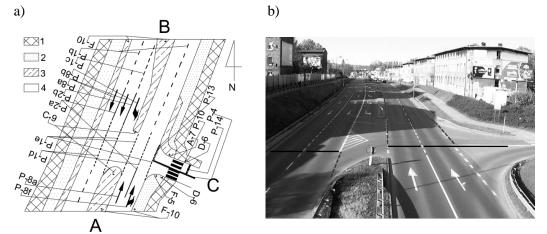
The intersection under study: a) the scheme of the intersection (designation of the surface type: 1 – sidewalk, 2 - grass, 3 - pavement, 4 - road); b) the view from the vantage point with marked virtual measurement sections (solid line - major traffic flows, dashed line - minor traffic flows) [own research]
